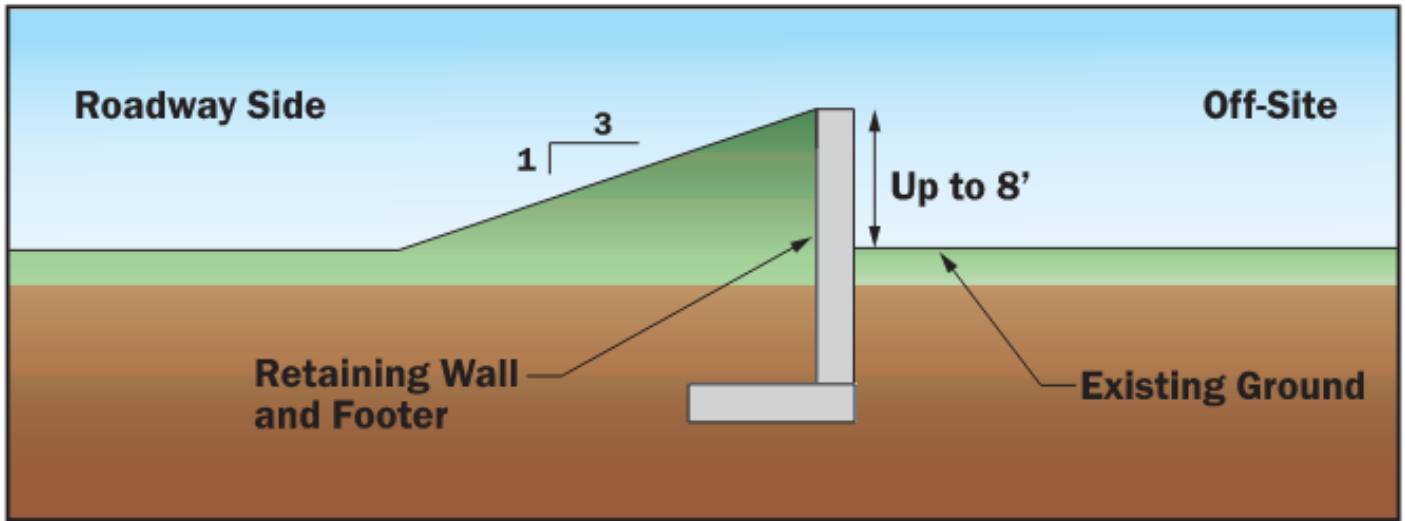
Cross section of a jump-out with embankment on the roadway side.
